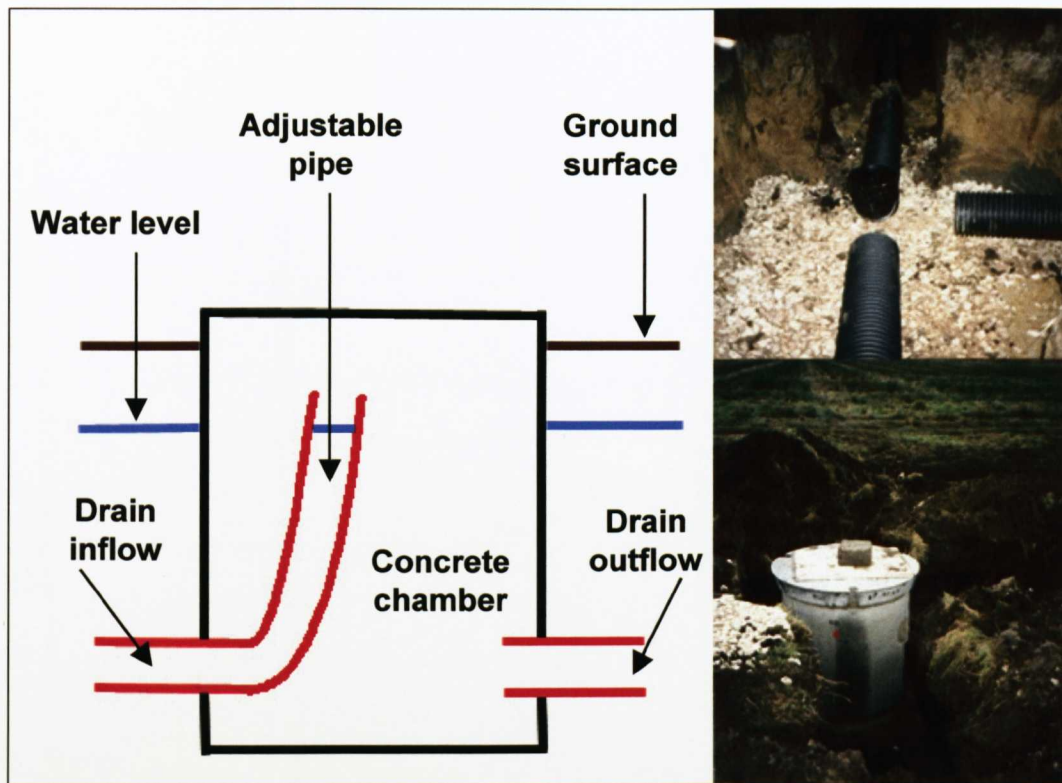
Diagram and photographs showing the re-engineered field drainage system installed on Sutton Common. The concrete chambers have a diameter of 1 m.
